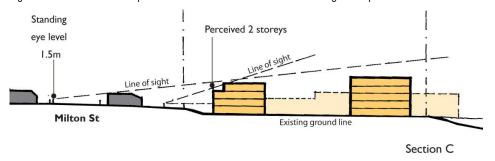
Section C- view impact of built form on Milton Street towards the oval
